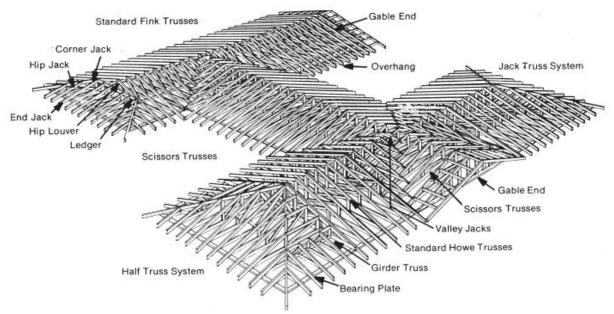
Wooden Truss Roofing System - Wood Frame Construction Manual Figure 2.18b Total Roof Truss System
